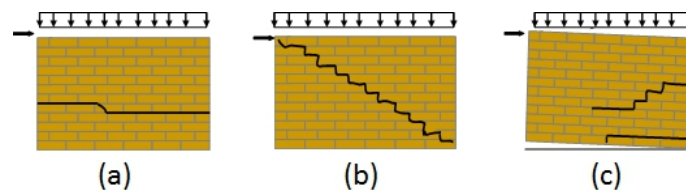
Modes of failure in URM walls subjected to in-plane forces: (a) Sliding along the bed joint. (b) Diagonal tension cracking. (c) Shear compression failure.
